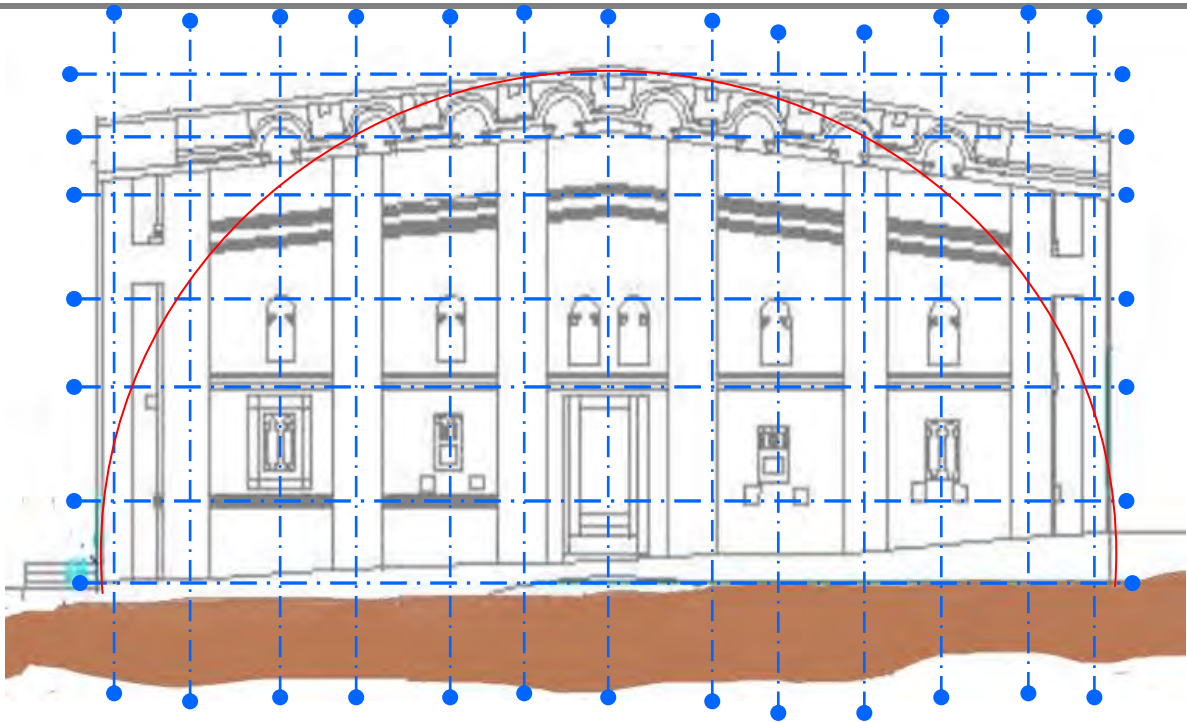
The Front (East-West) Elevation Plan of Bete Medhanealem
